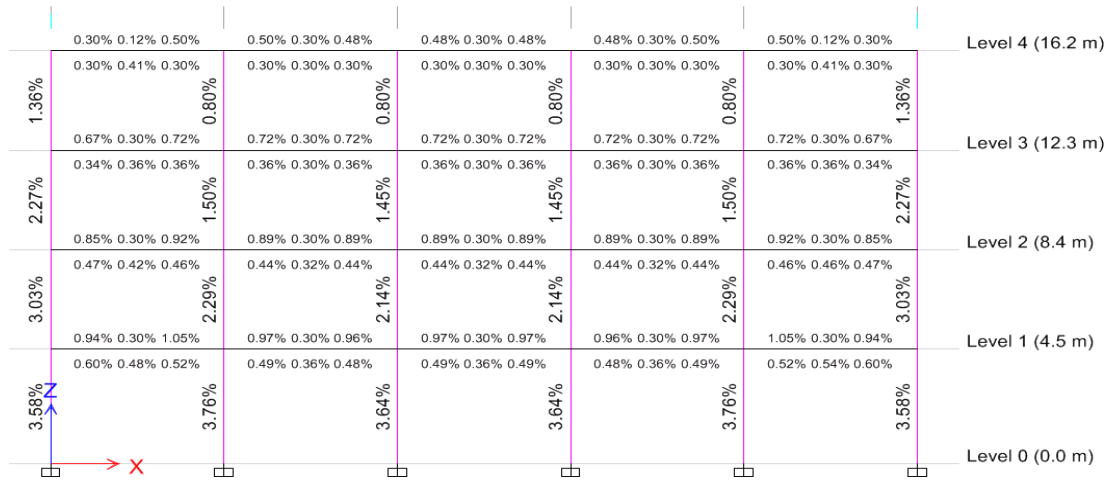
Required longitudinal reinforcement for building ID 2235
